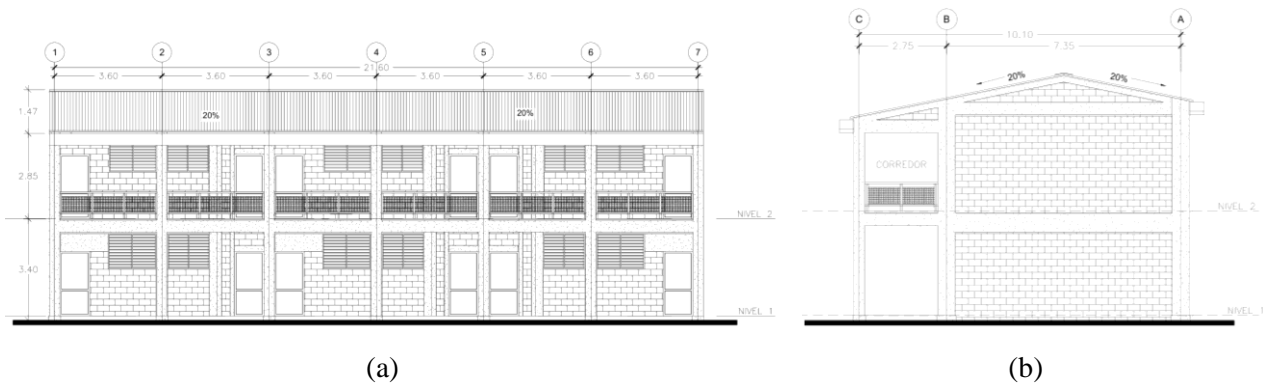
(a) RC3 building, longitudinal direction, (b) RC3 building, transverse direction.
